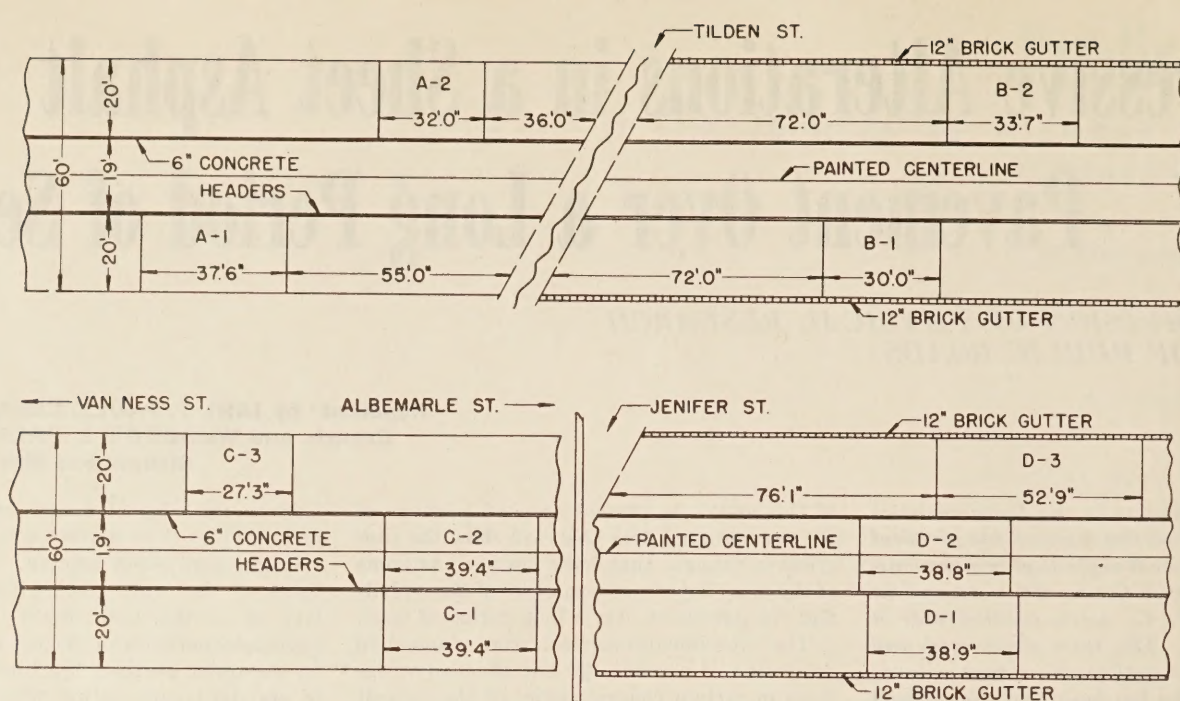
Location of test sections on Connecticut Avenue in Washington, D. C.
